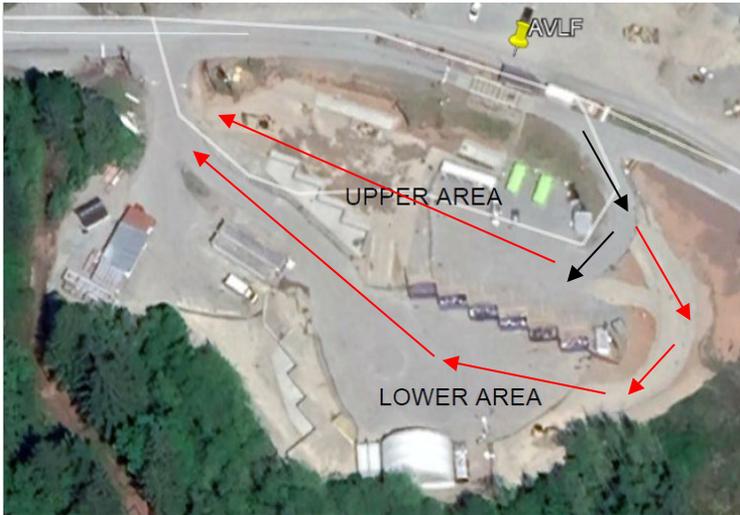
New roadway and new traffic pattern is shown in red. New zig-zag or "Z" walls are shown in the left side of the Upper Area (residential PPP drop off) and Lower Area (curbside collection).
